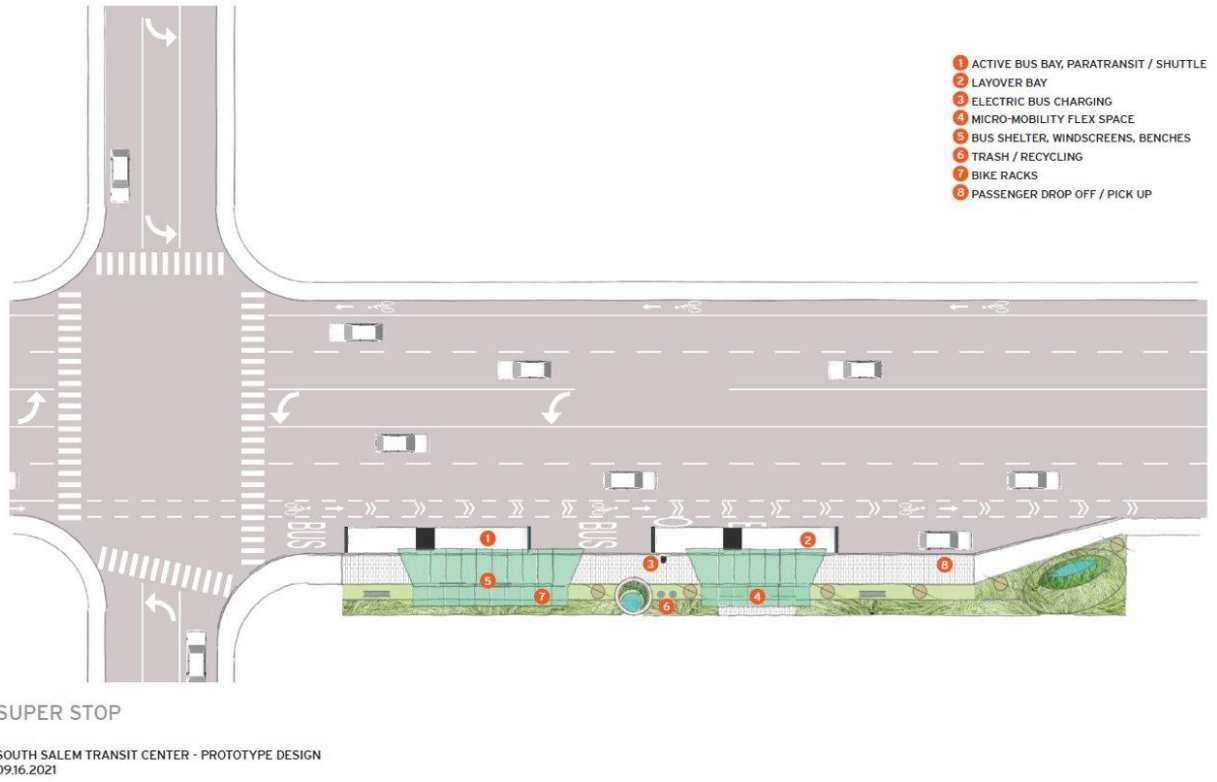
South Salem “Super Stop” Prototypical Design – View 1
